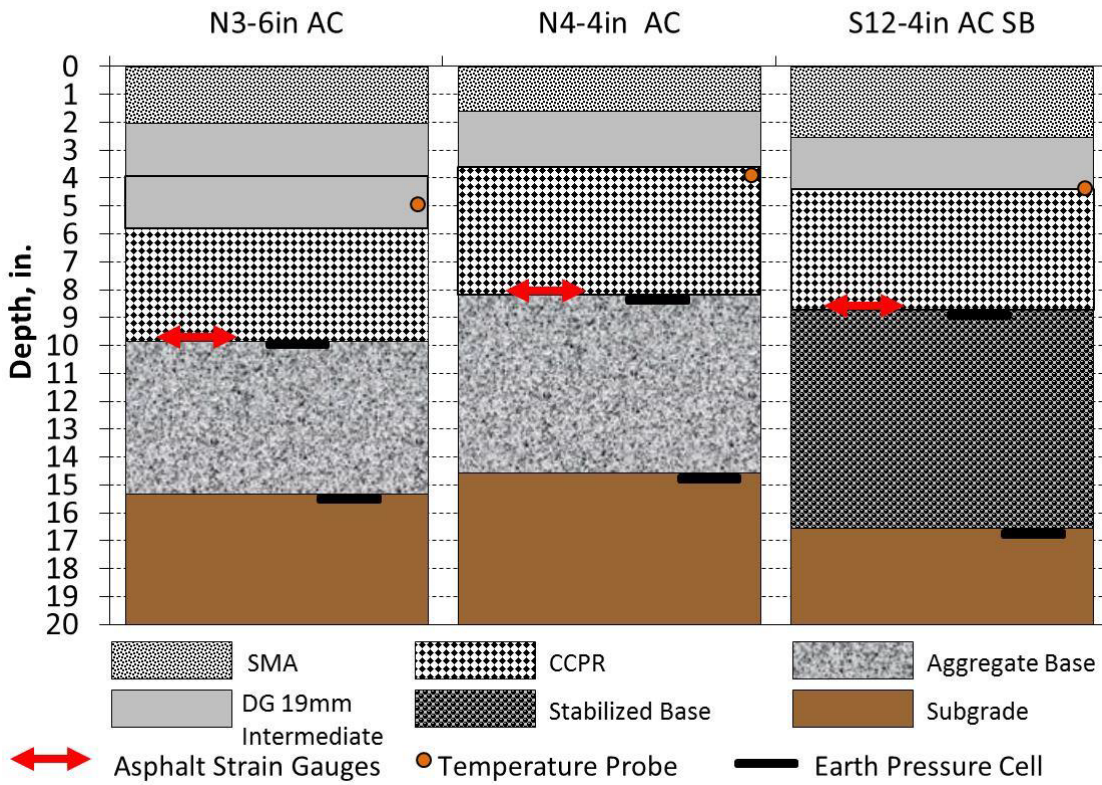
Pavement Structure (As-Built) of Each Test Section.
